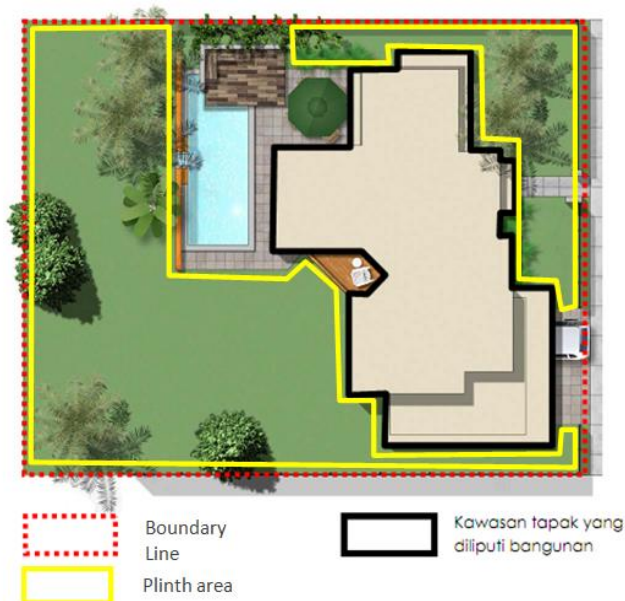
Small building plinth area over an area of the site provides harmony with availability of more space on the ground floor in a development.
